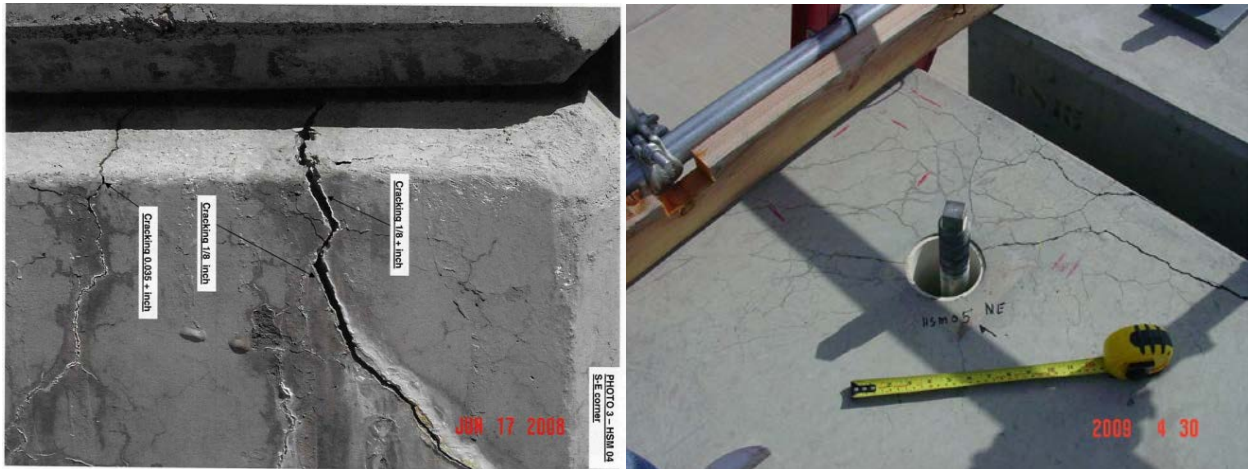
Observed cracking of concrete dry cask at Three Mile Island [33]
